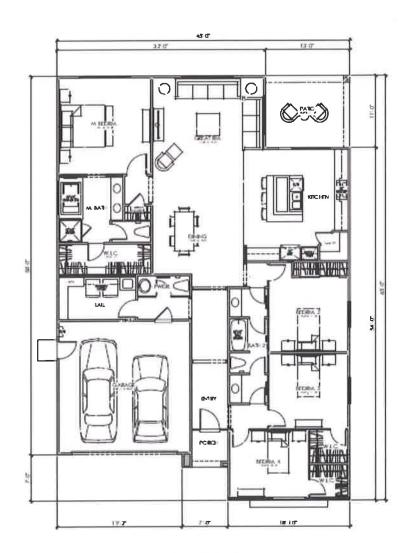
STIRLING HILLS FLOOR PLAN 2
